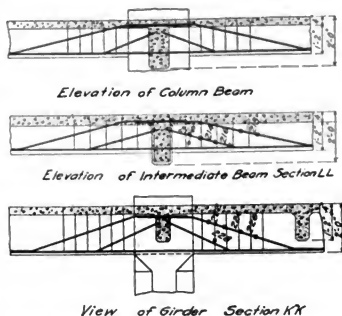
DETAIL OF BEAM AND GIRDER SHOWING REINFORCEMENT AT SUPPORT.
